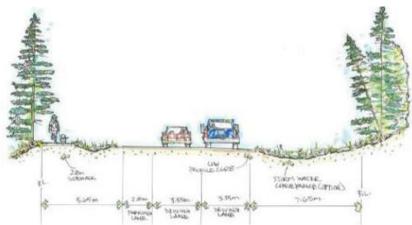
Residential Collector (RC2 - Parking one side) (22.0 m)
